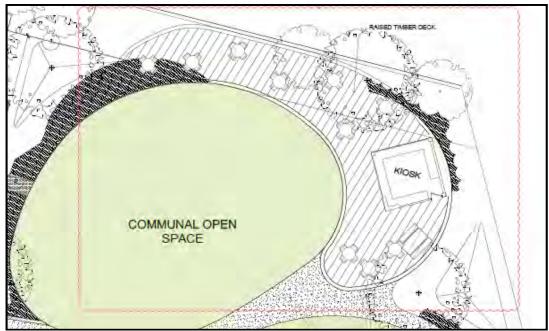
Approved Site Plan showing kiosk building (approved under DA2015/100/03)
